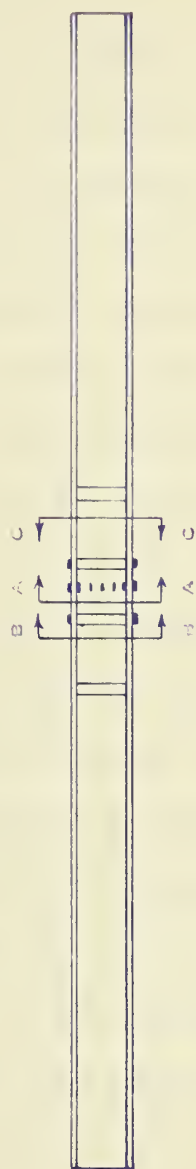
GENERAL VIEW OF BEAM TEST EQUIPMENT
